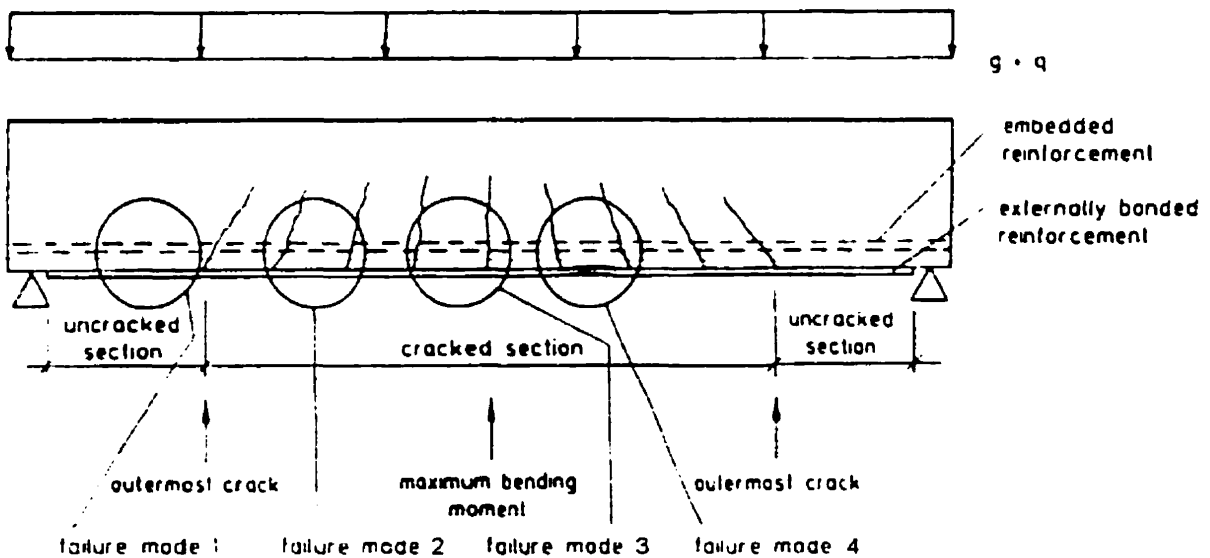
Locations of bond failure due to FRP peeling-off [adapted from 18]
